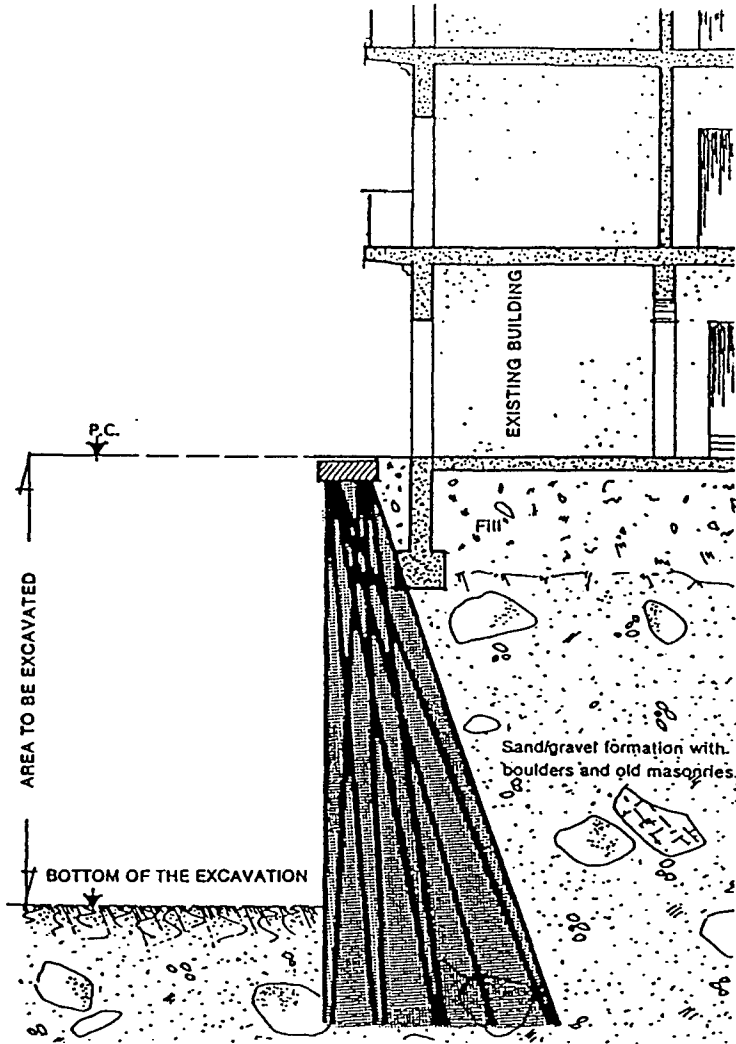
illustrates the application as a retaining wall, protecting the foundation of an existing building during the excavation of a cut-and-cover section. Figure 31 shows a similar, more recent application -- support of excavation in a road-widening project. In both cases, surface access was severely restricted, and major restraints had been placed on noise and waste emission levels. Each example was essentially a CASE 2 design, but the latter structure also had a CASE 1 function as it was, over part of its length, subjected directly to compressive structural loads by a new bridge deck bearing on its capping beam.
